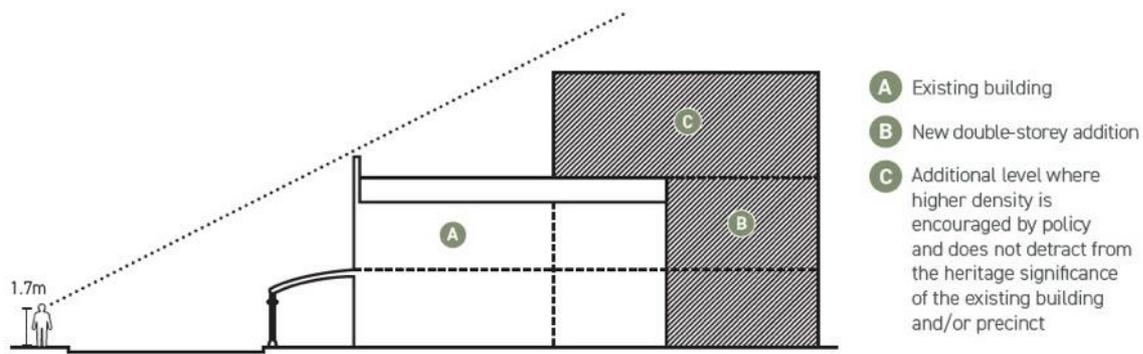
Example showing additions behind a double-storey shopfront with a parapet.
